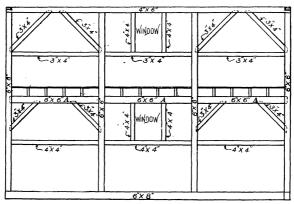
Construction of sides of \$275 barn. (Design No. 2.)
